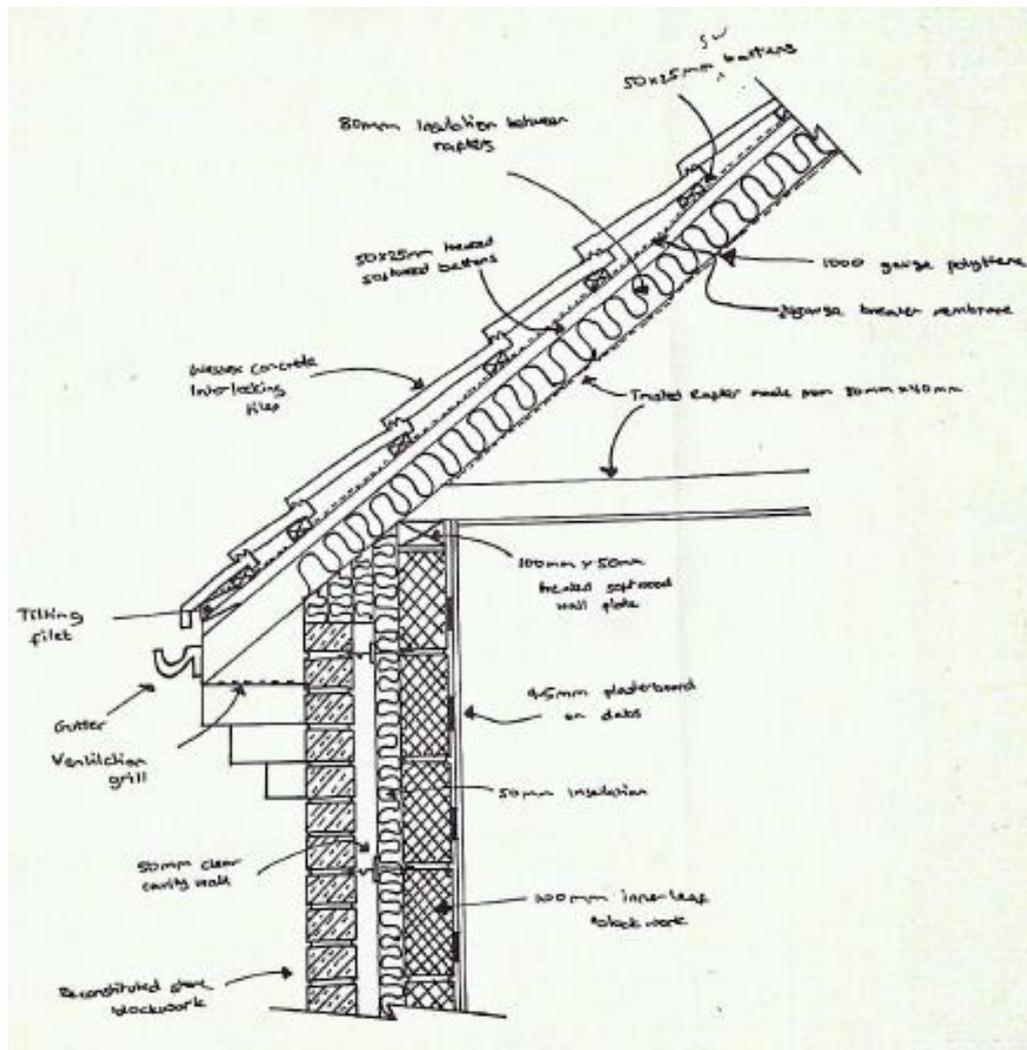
Traditional roof and wall detail (Ali, 2009)
